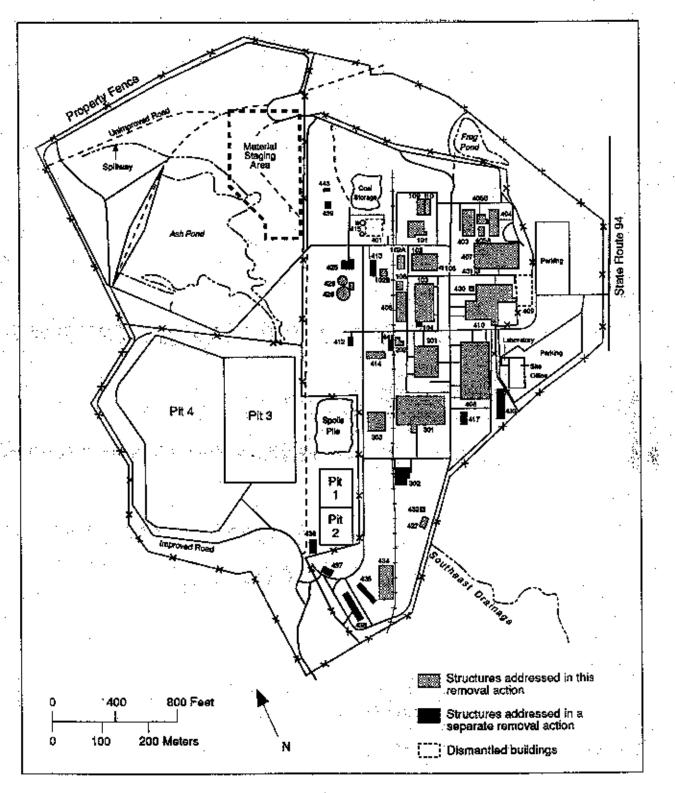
Site Layout Showing the Locations of Contaminated Structures
